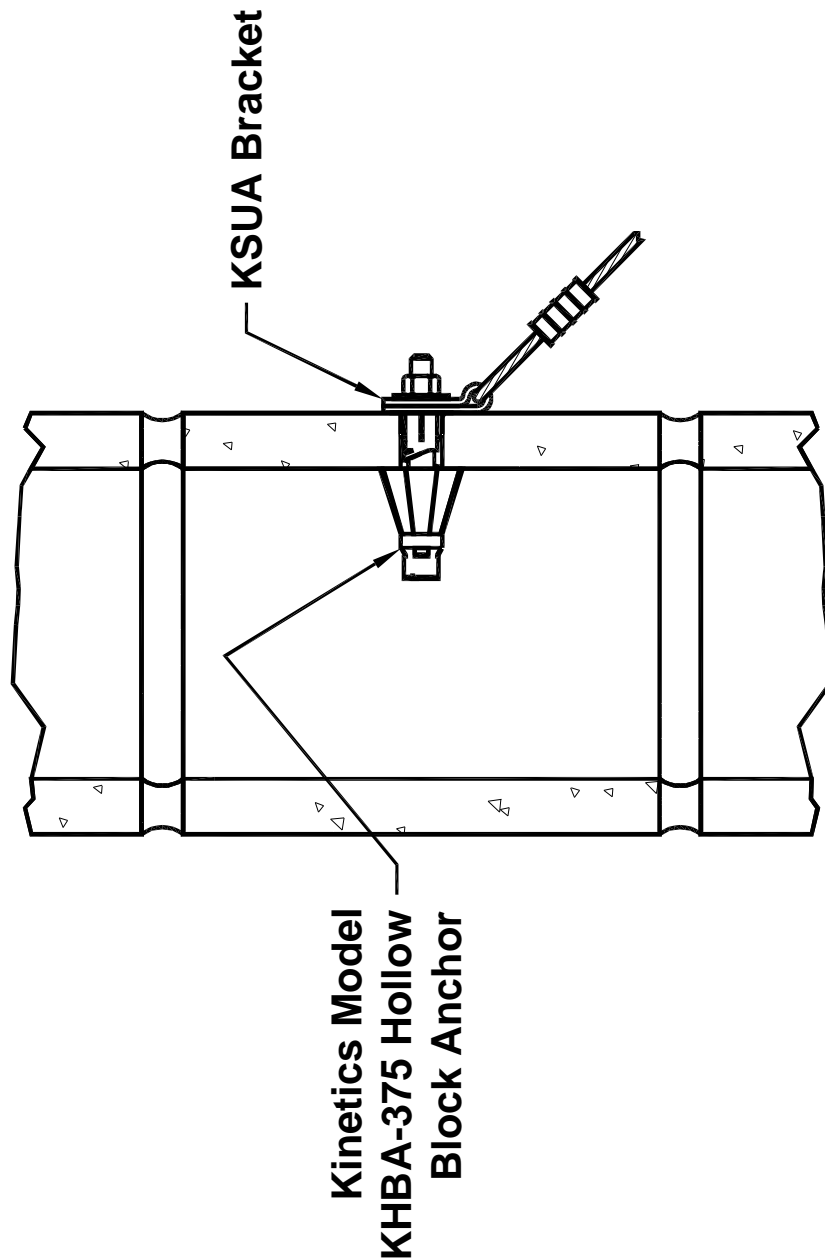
; KSUA “Umbrella” Type Adhesive Anchor Attachment to a Hollow CMU Wall
